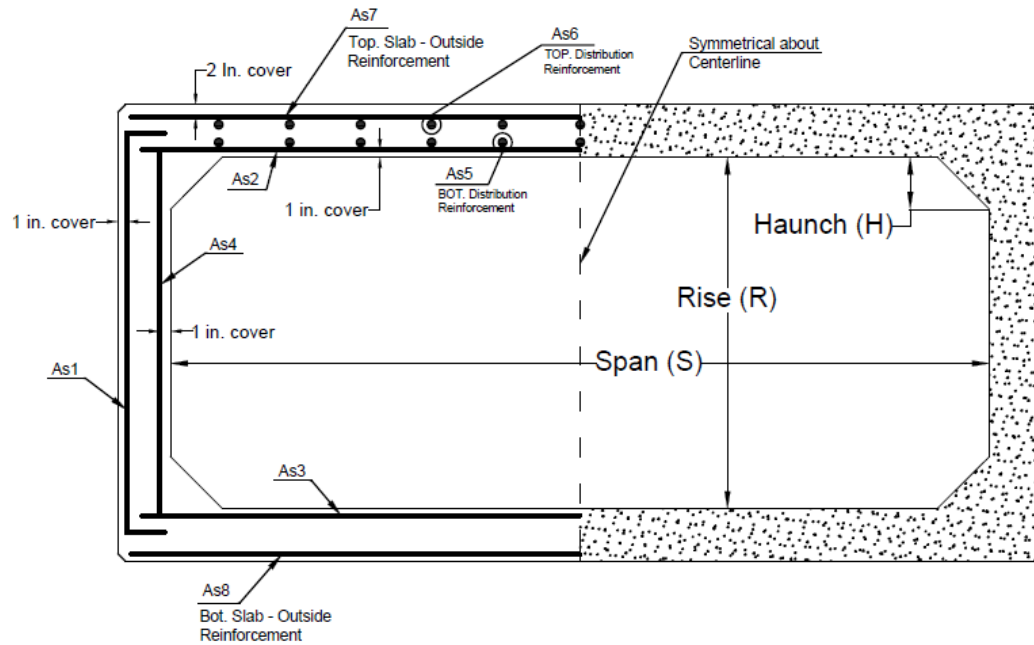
Typical reinforcement arrangement in Box culverts
